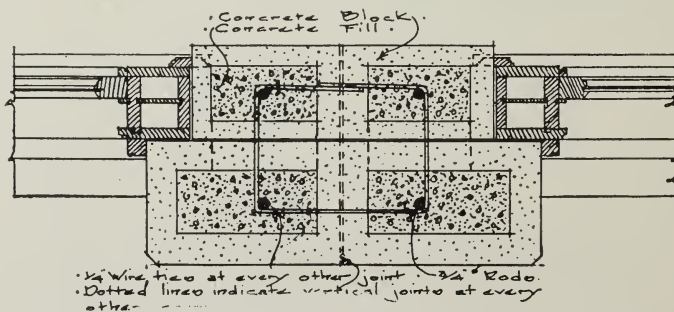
Concrete Wall Column, Laundry Building, Salem, Mass.
